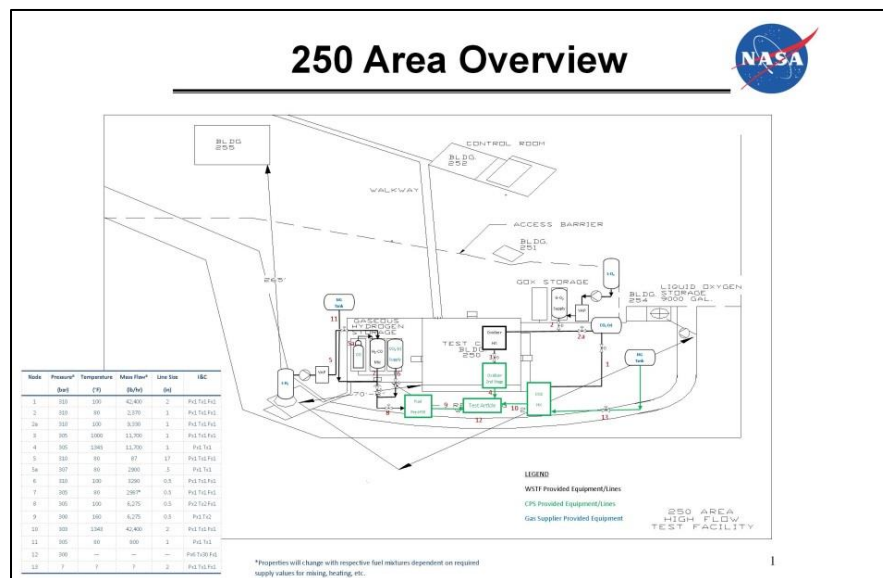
LAYOUT OF TEST SITE AND AUX SYSTEMS
